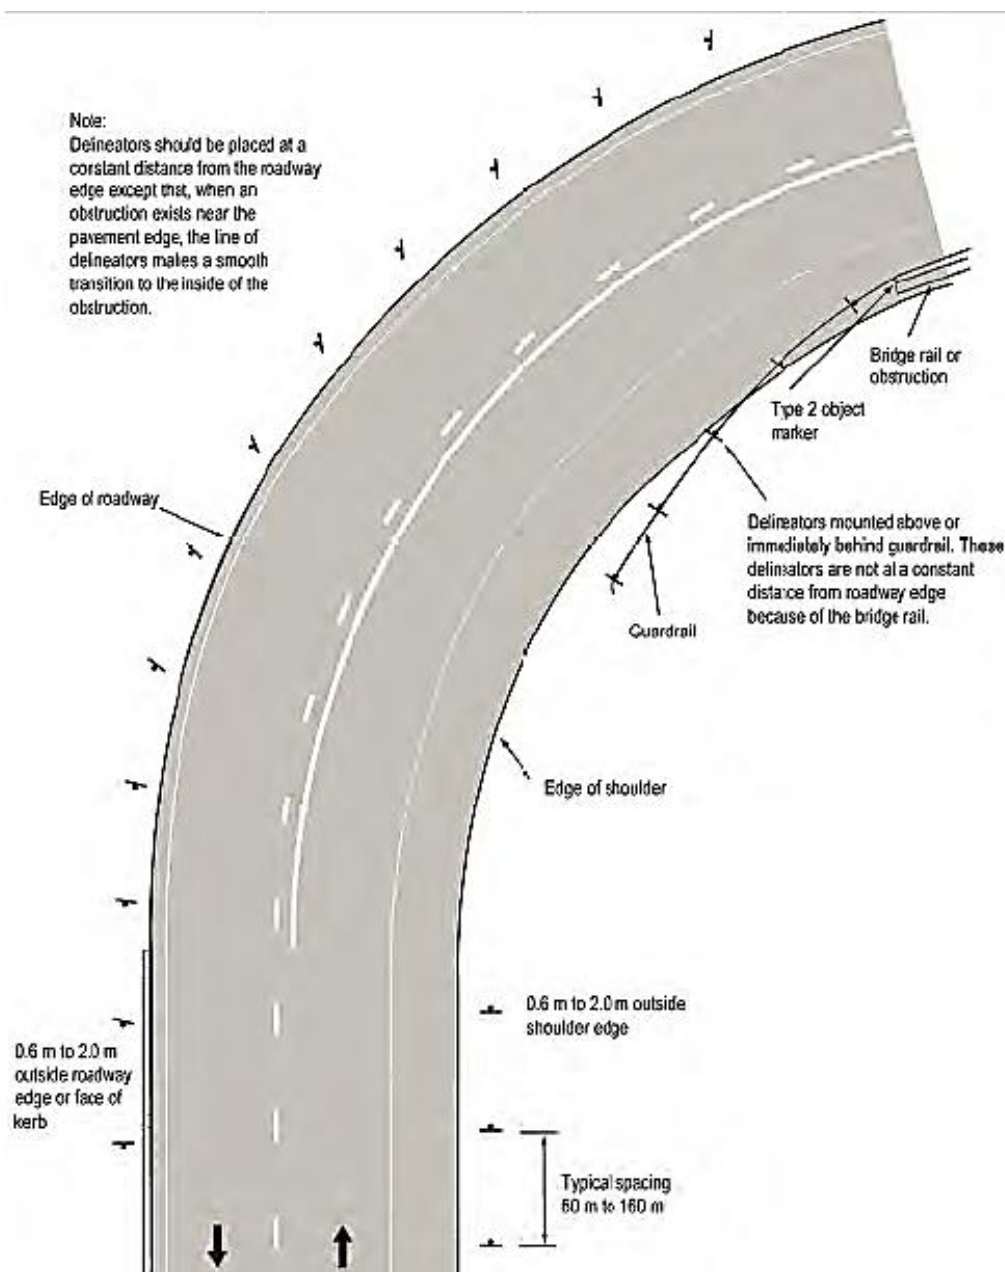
/27: Typical Delineators Installations [3, p.6-26]
